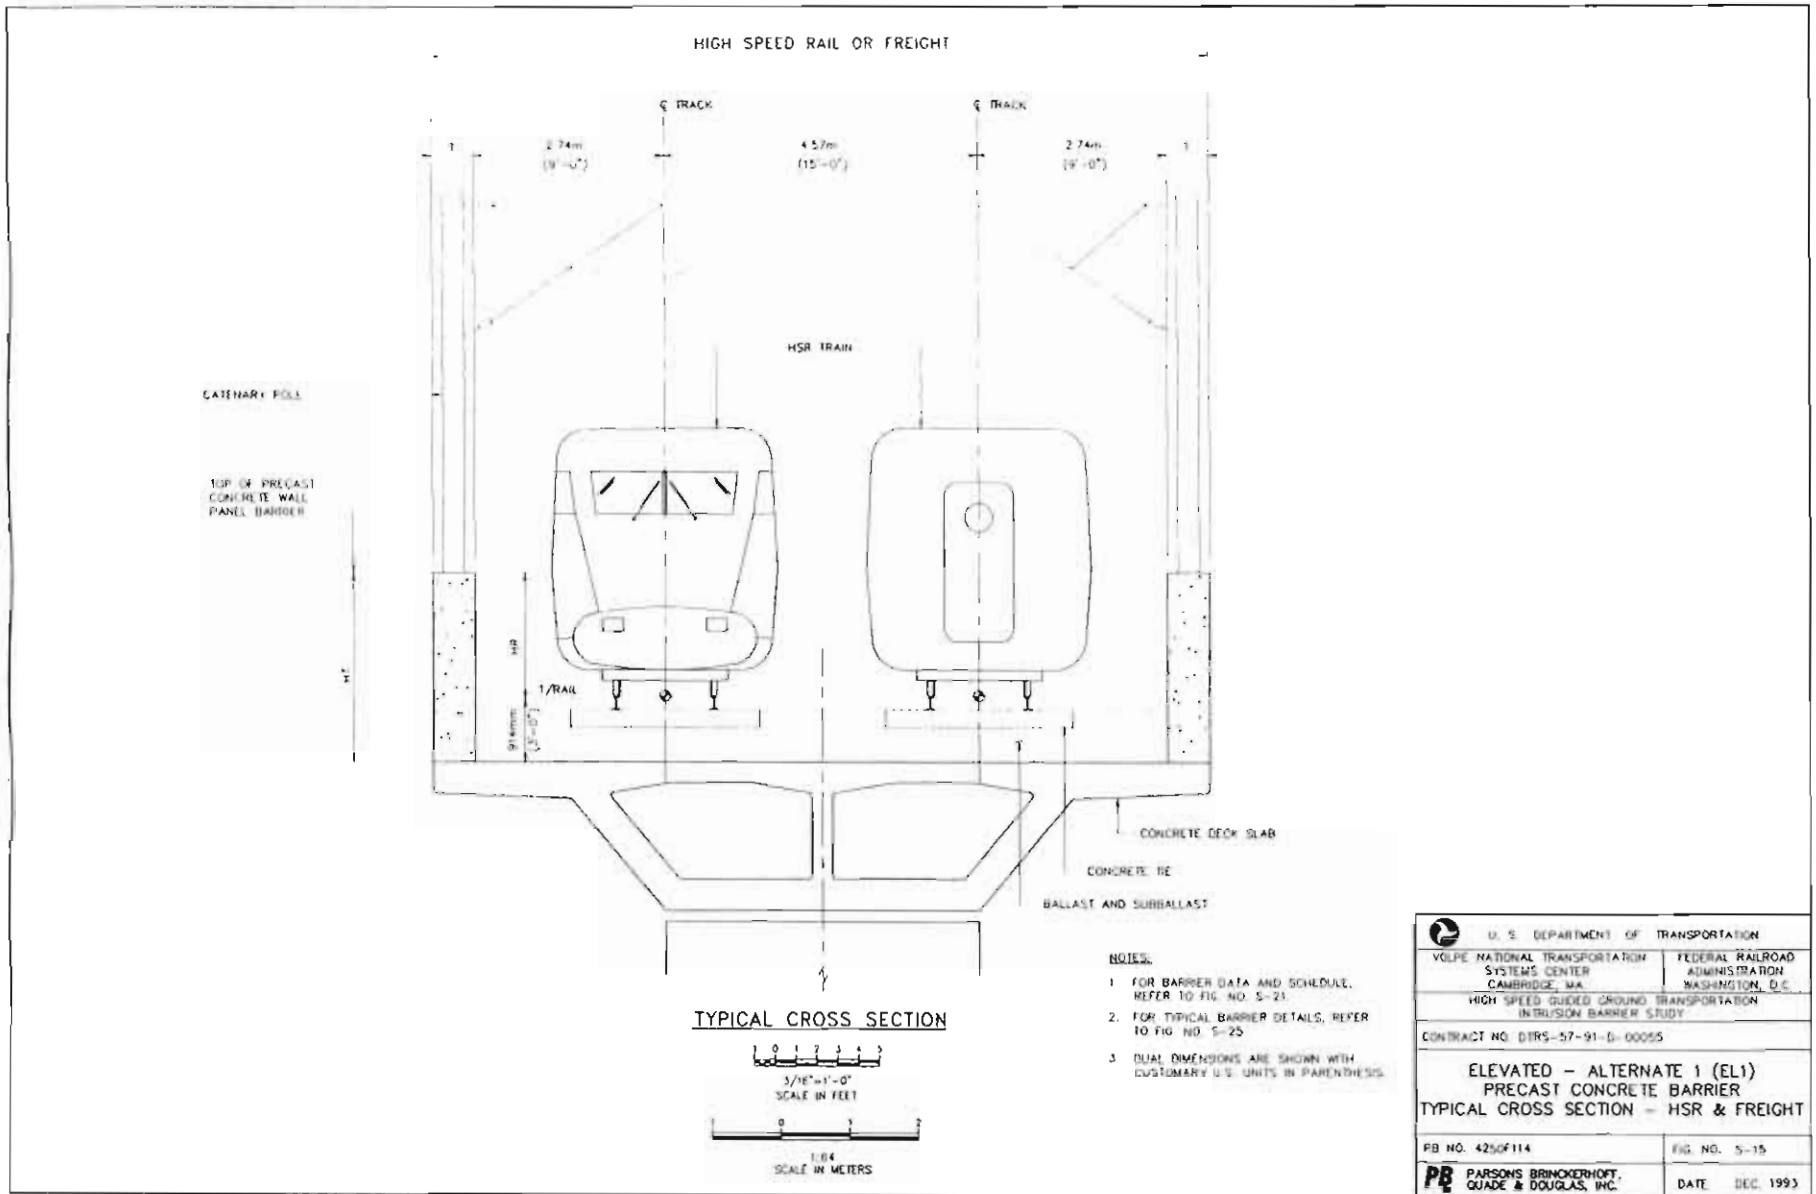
ELEVATED ALTERNATE 1: PRECAST CONCRETE WALL - TRANSVERSE SECTION/RR
